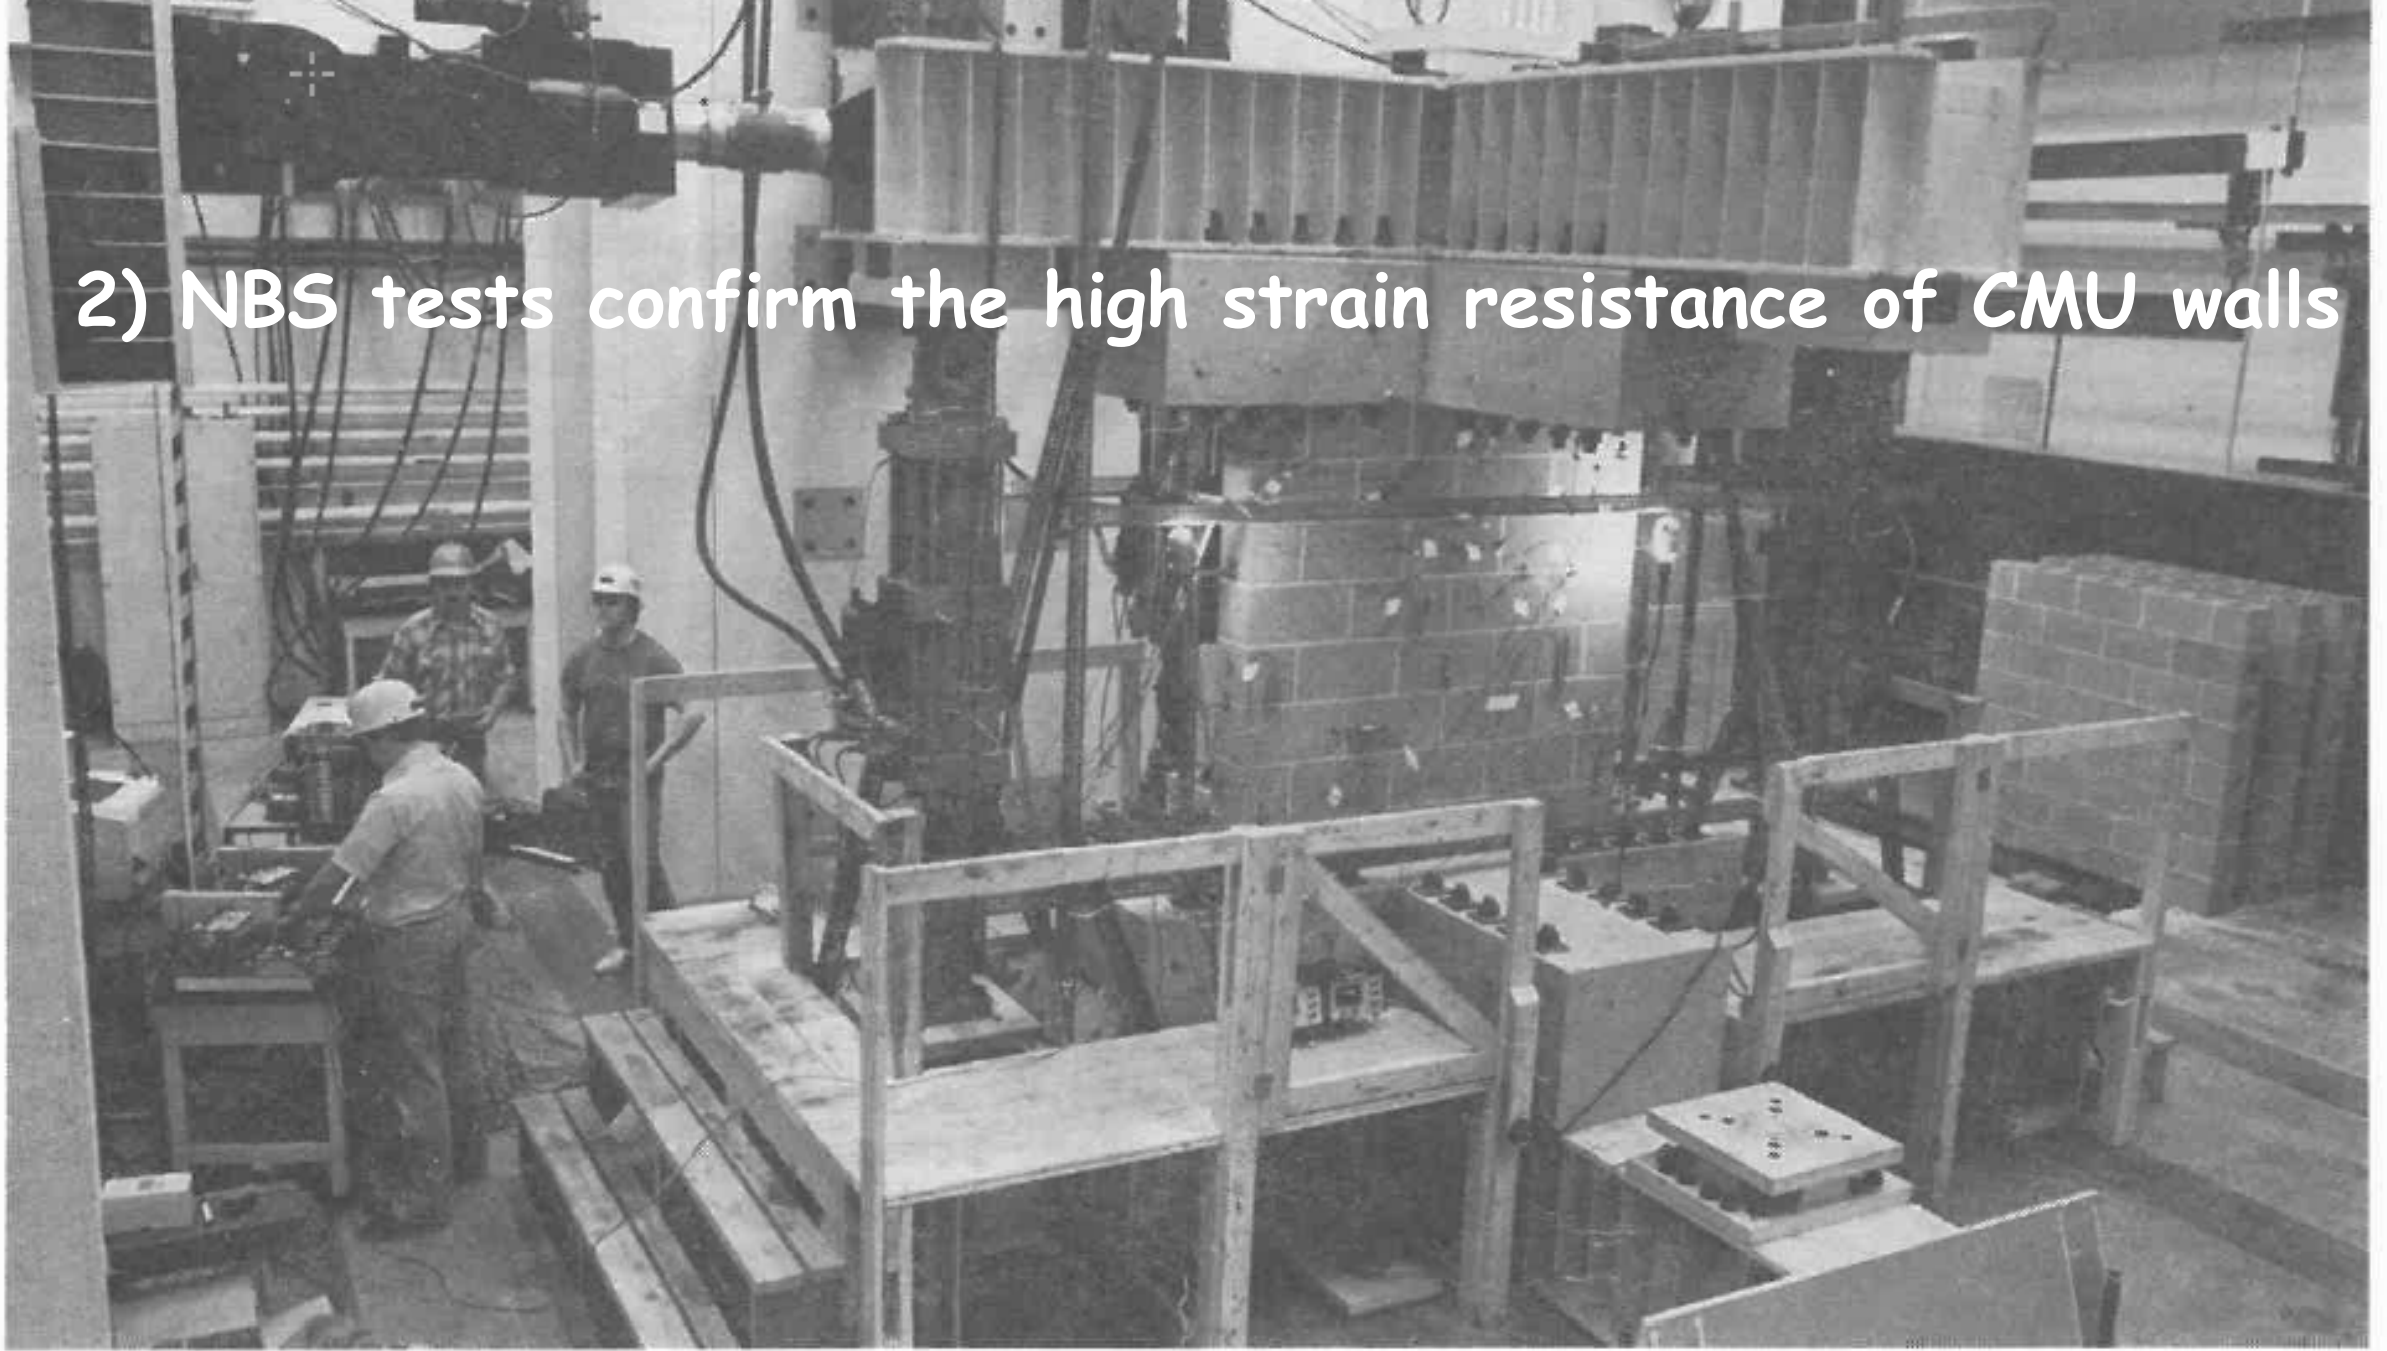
In-place 5- by 5-ft masonry block wall at NBS Tridirectional Test Facility.
